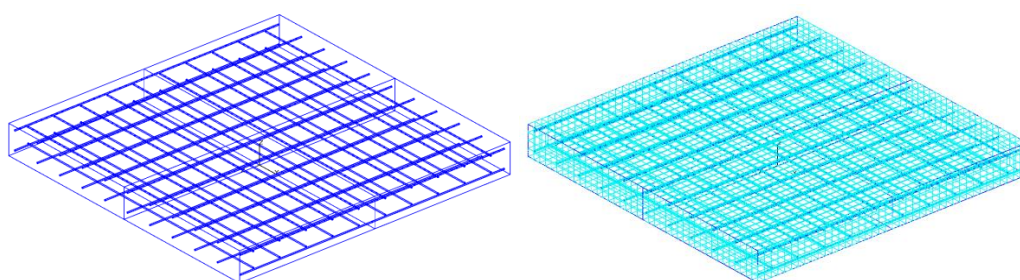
Numerical model of the section of a reinforced concrete plate (left), with elements (right)
